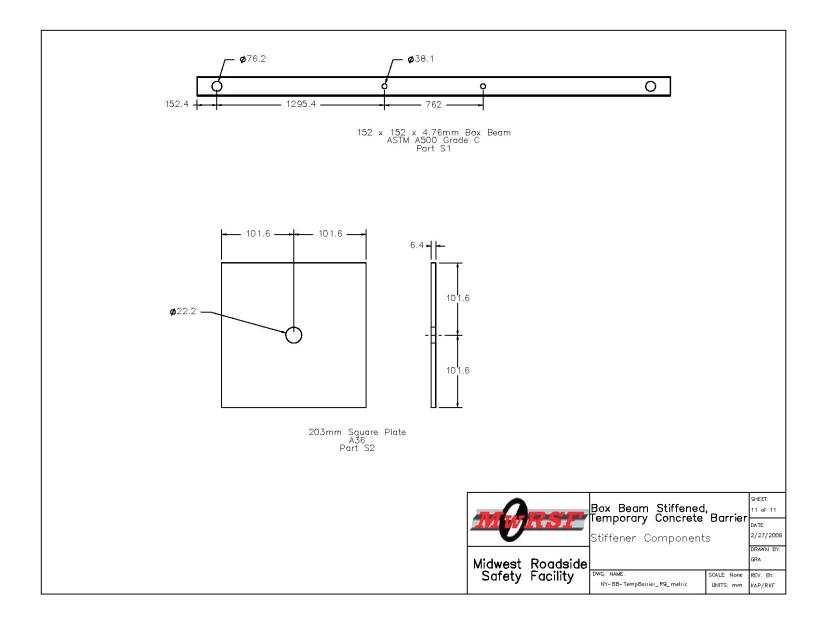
Box Beam Stiffener Details, Test NYTCB-1
